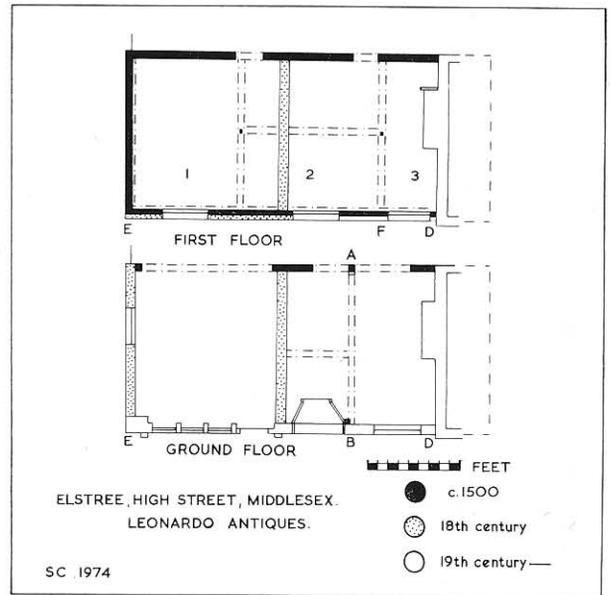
Leonardo's: ground and first floor plans of the three bay hall.
